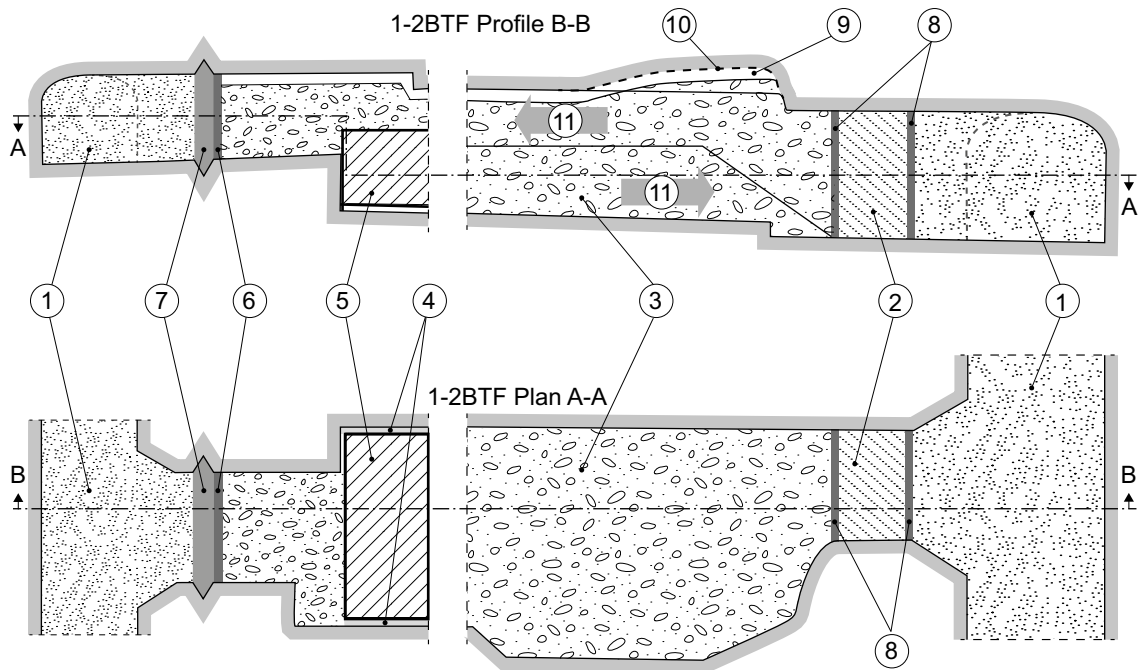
Schematic profile and plan of 1BTF and 2BTF after closure. Key to numbering: 1) Bentonite 2) Transition material e.g. 30/70 mixture bentonite crushed rock 3) Macadam 4) Concrete between waste and rock wall 5) Grouted waste packages 6) Constraining wall and concrete form 7) Mechanical plug of concrete 8) Constraining wall of concrete for transition material 9) Open gap between macadam and tunnel roof 10) New rock profile 11) Working direction when backfilling the waste vault.
